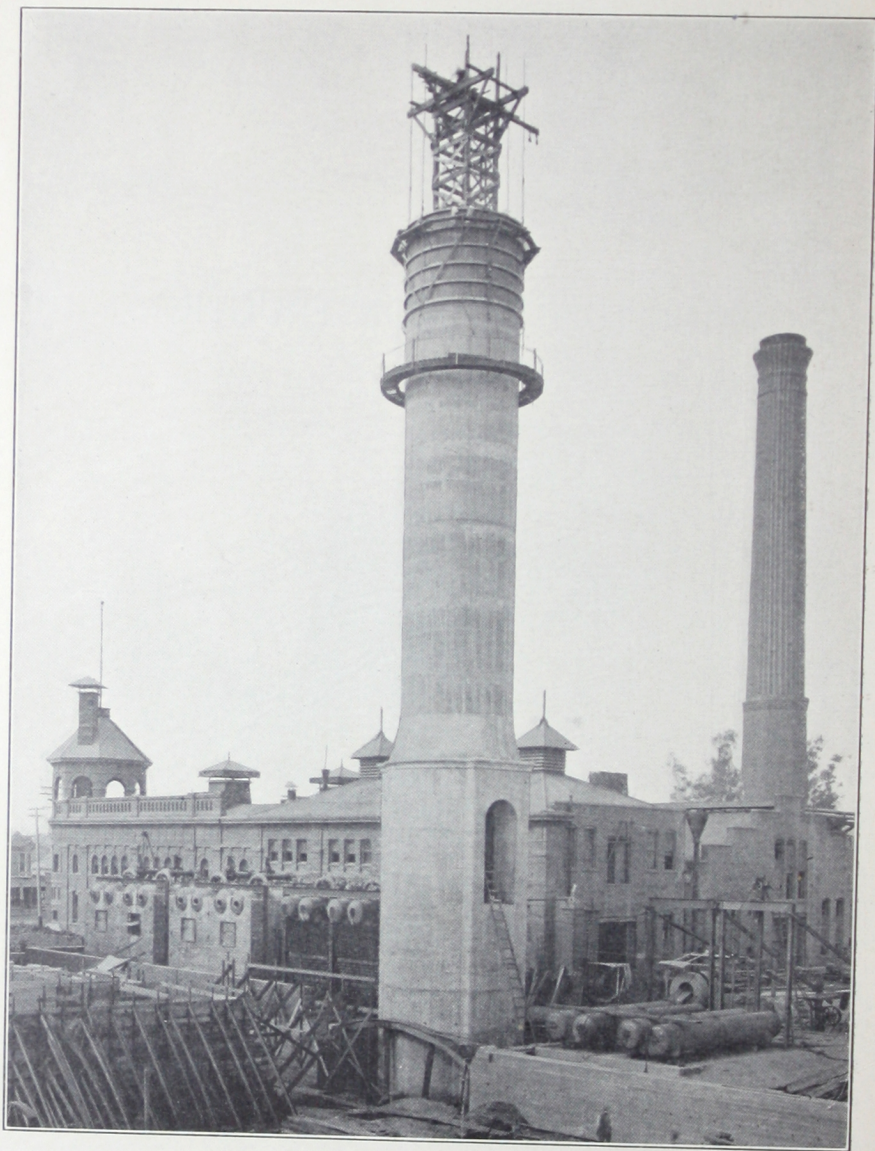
PLATE II. CONCRETE CHIMNEY, RANSOME SYSTEM.
